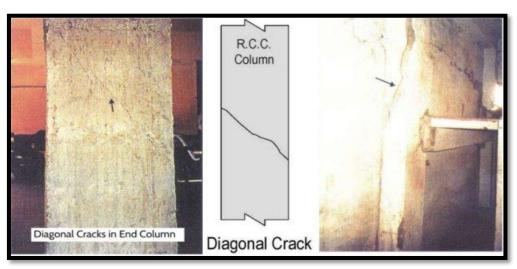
Diagonal Crack In The Concrete Column [3] [4]
